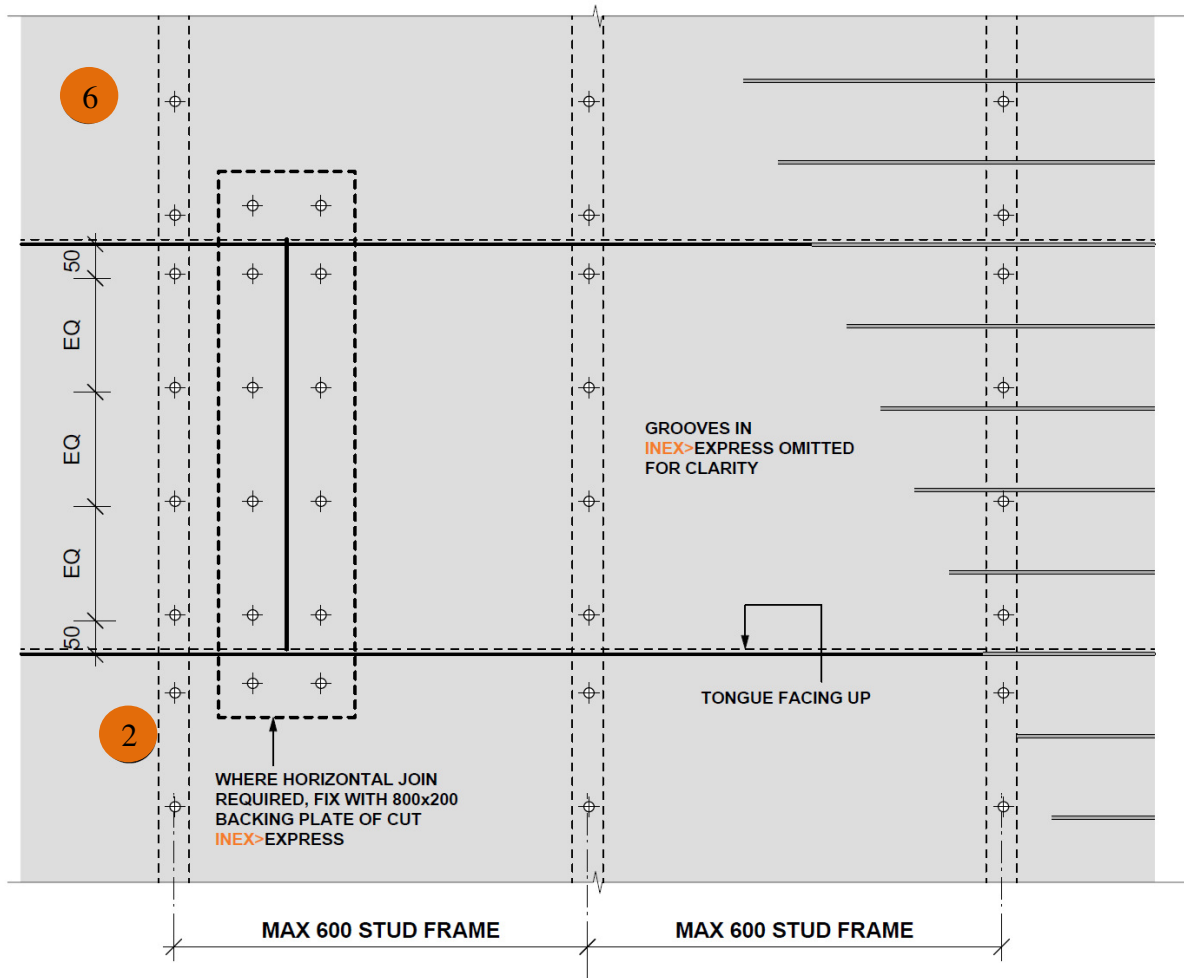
Horizontal UBIQ INEX>EXPRESS Wall System Steel or timber frame – Sheet fixing details
